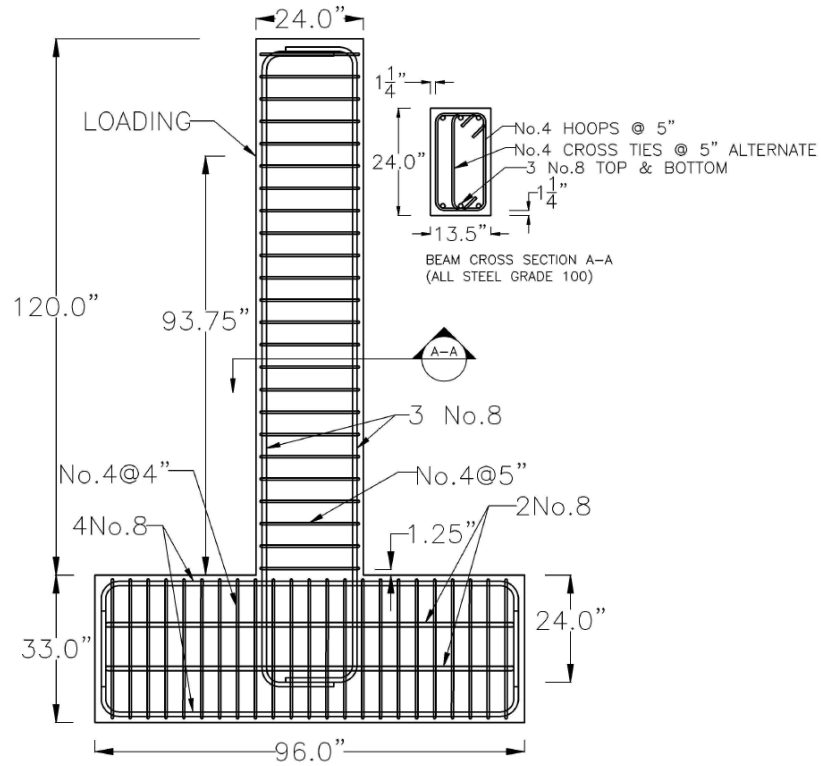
Reinforcement Details for Beams SBL100, SBH100, and SBM100
